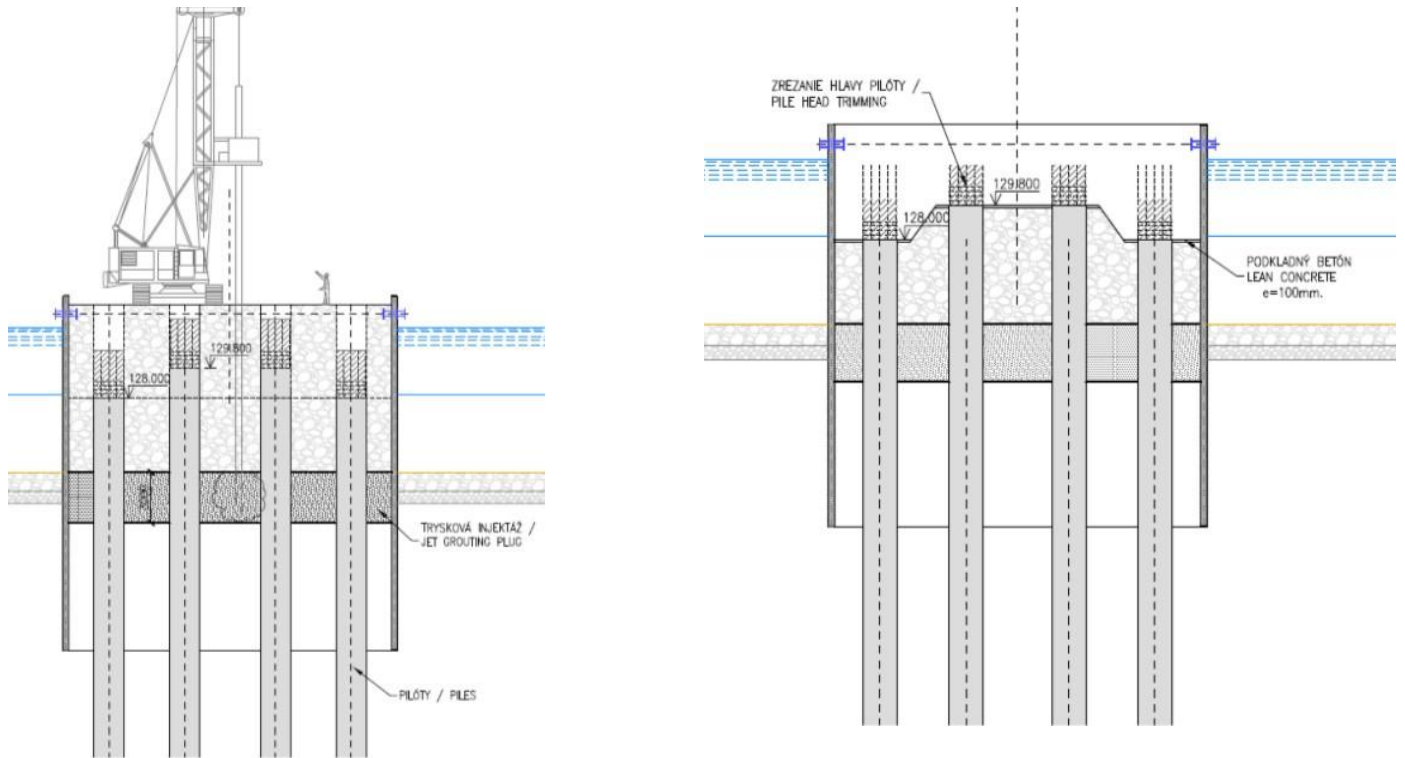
Cross section of the “cofferdam island” (on the left) with tension bars in the bracing level and the construction pit (on the right) with pressure in the bracing level - Excavation of foundation (extract from D4R7 tender documentation)
